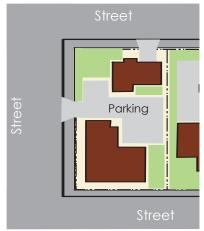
Parking Locations, Interior Lot Versus Corner Lot
